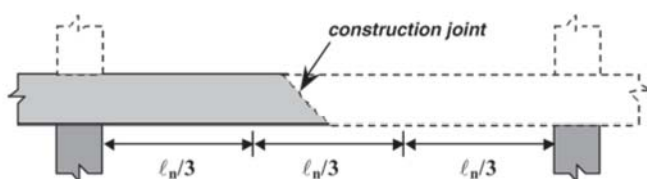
Construction joints in slabs, girders, and beams.
